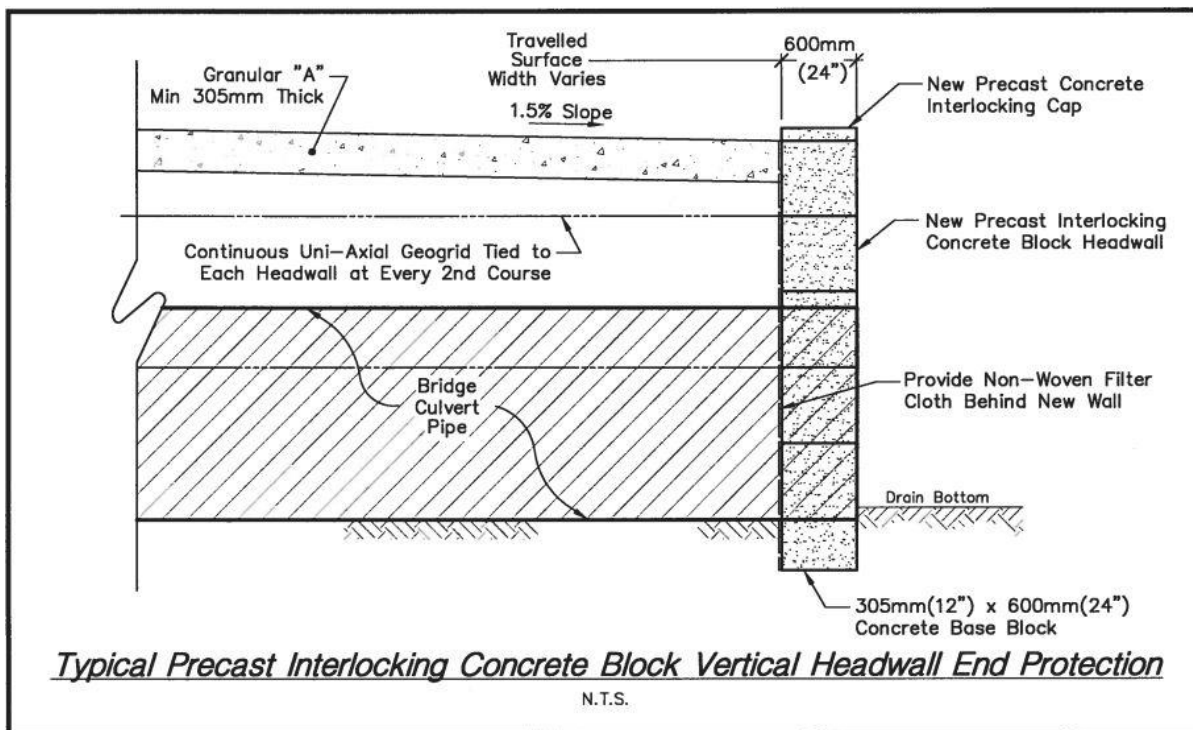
Typical Precast Interlocking Concrete Block Vertical Headwall End Protection
